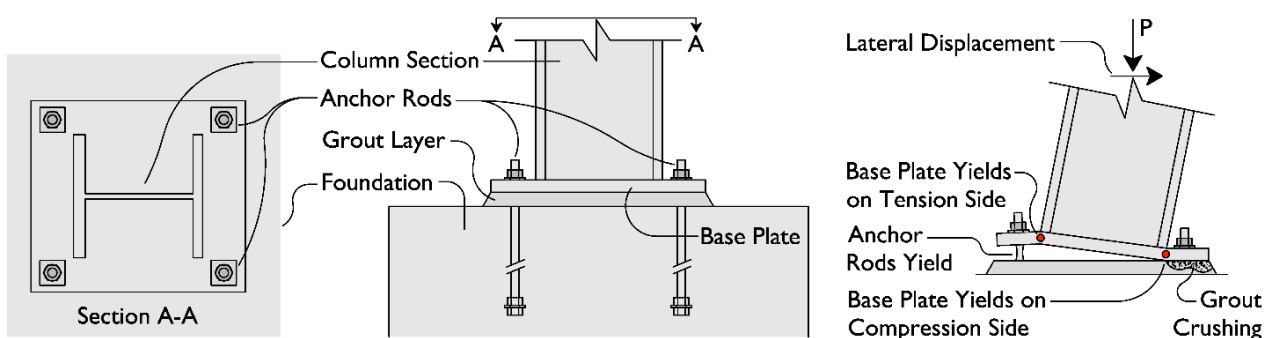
Typical steel gravity column base plate connection and failure modes
